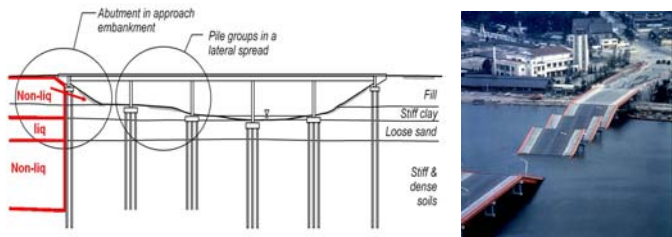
Bridge foundation subjected to lateral spreading and superstructure inertial load
